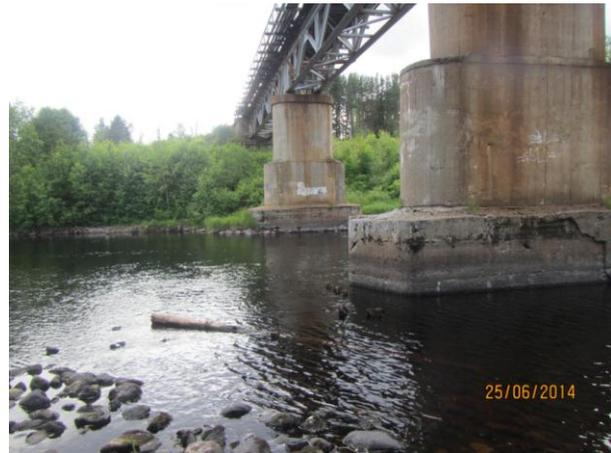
Railway bridge piles in the Tulemajoki river (Source: Esa Laajala).
